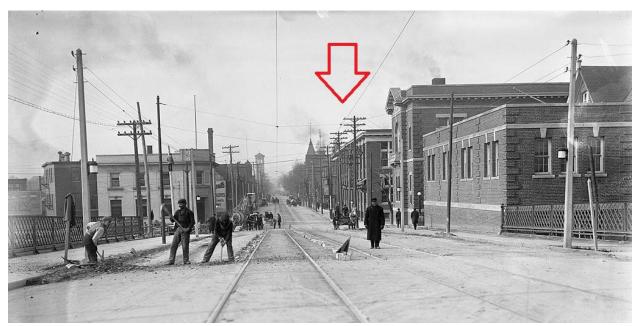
Archival photo (1914) looking west from the Don River along Queen Street East. New Method Laundry building with original signage and adjacent National Electric Heating building with parapet/false front visible along north side of the street (indicated by red arrow). City of Toronto Archives, Series 372, s0372_ss0058_it0353.
